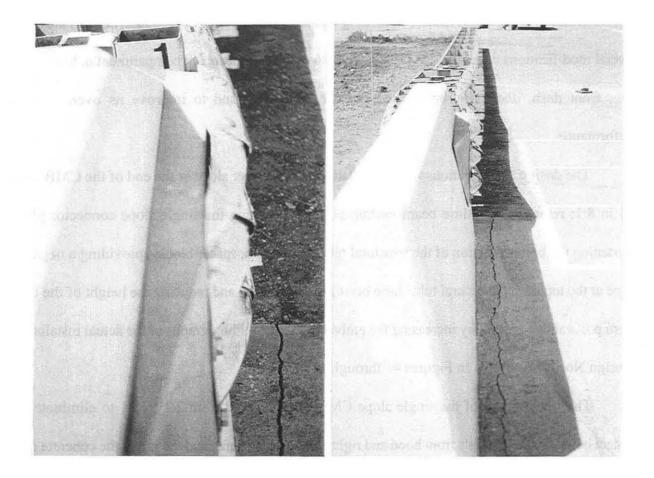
Cracking of Concrete Foundation, Test MTSS-1
